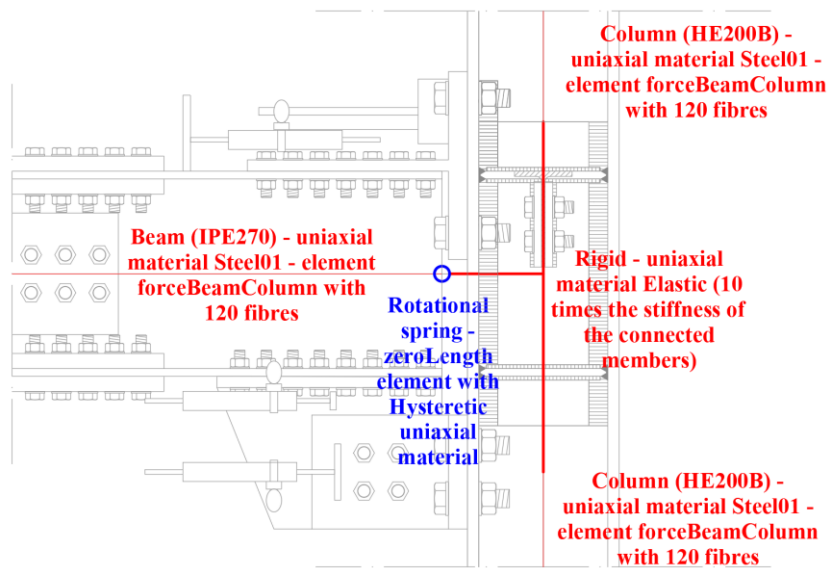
FE model of the beam-to-column connection (initial model)
